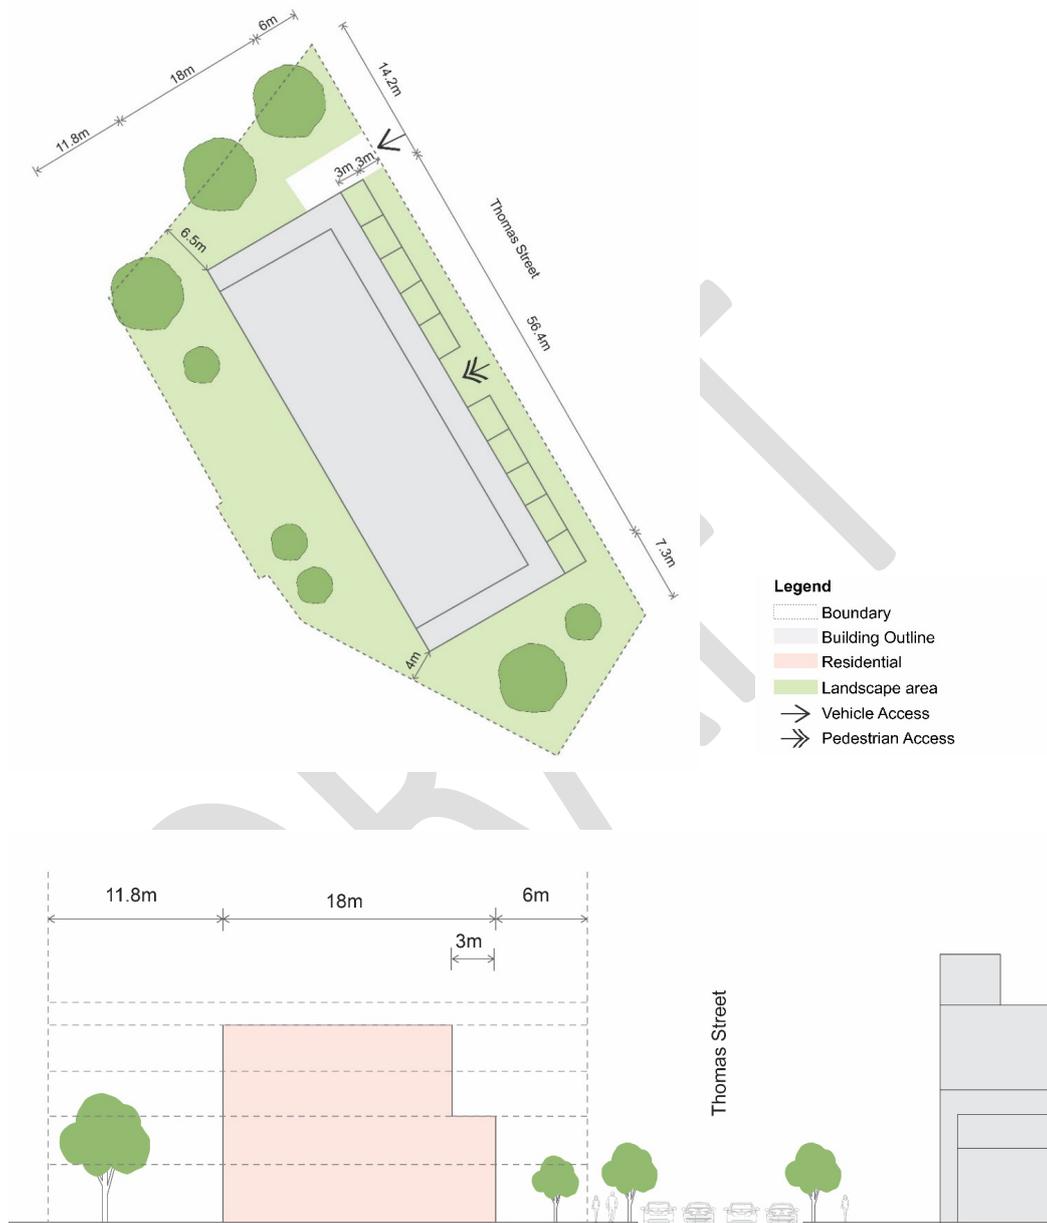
Canterbury Road East, southern site indicative solution that achieves storeys, building envelope, scale and site layout – plan and section
